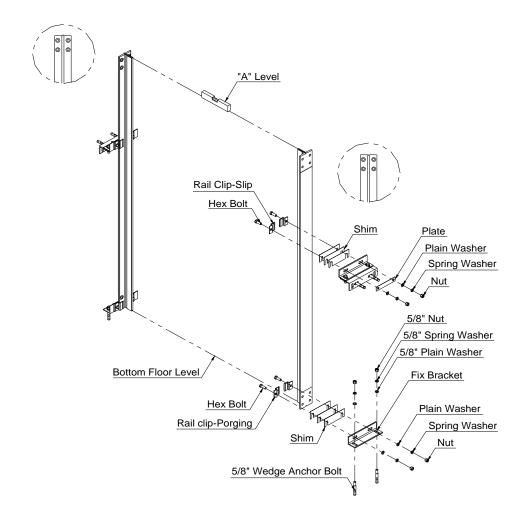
B. BOTTOM GUIDE RAIL INSTALLATION TYPE "B"
